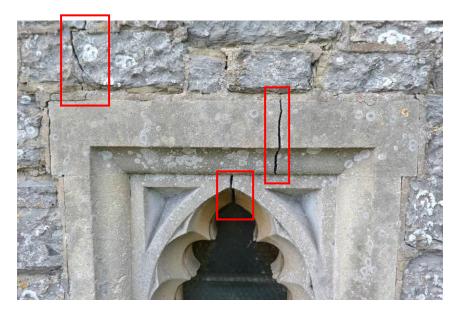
P1000269 Masonry Fracture & Open Joint in 2nd Stage Window Header North Elevation
